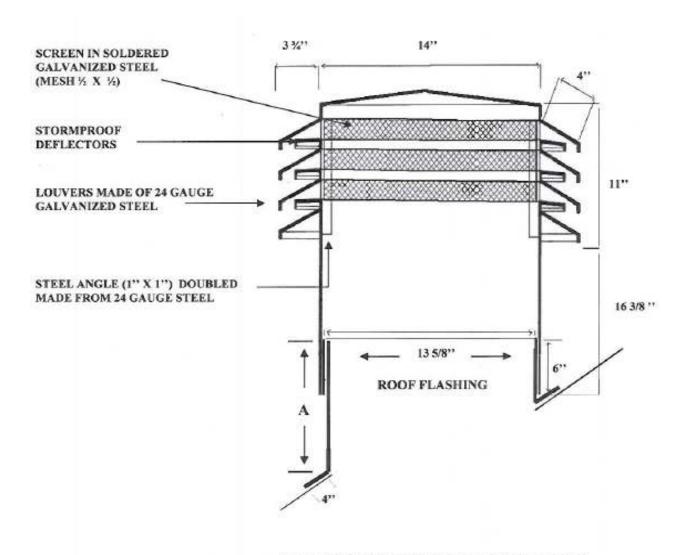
#### DETAIL DRAWINGS ROOF VENTILATOR #301 (12 x 12)
